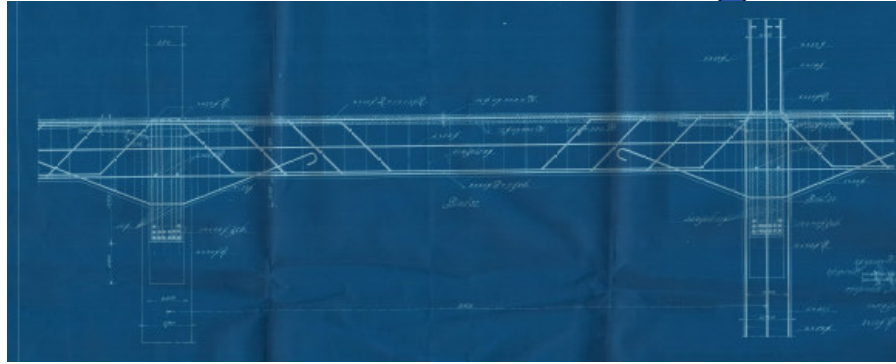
Typical main beam from the original structural drawings (1916).
